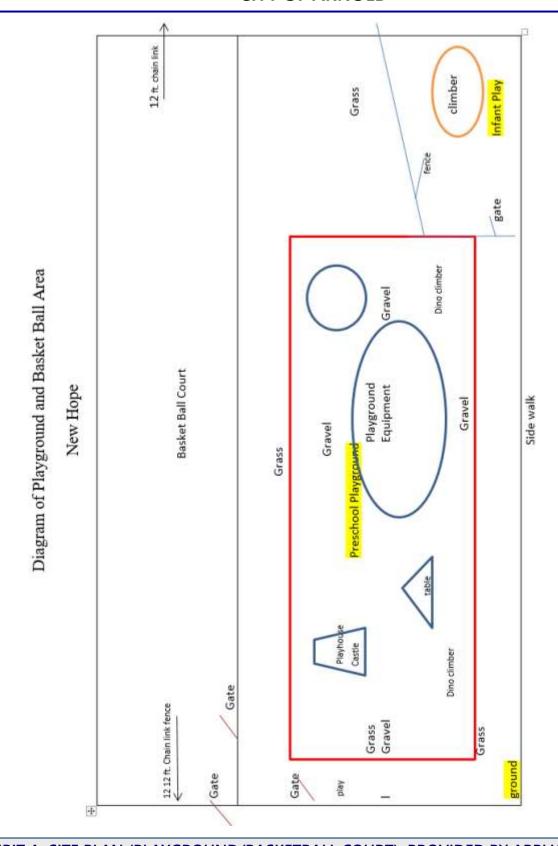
EXHIBIT A: SITE PLAN (PLAYGROUND/BASKETBALL COURT), PROVIDED BY APPLICANT
